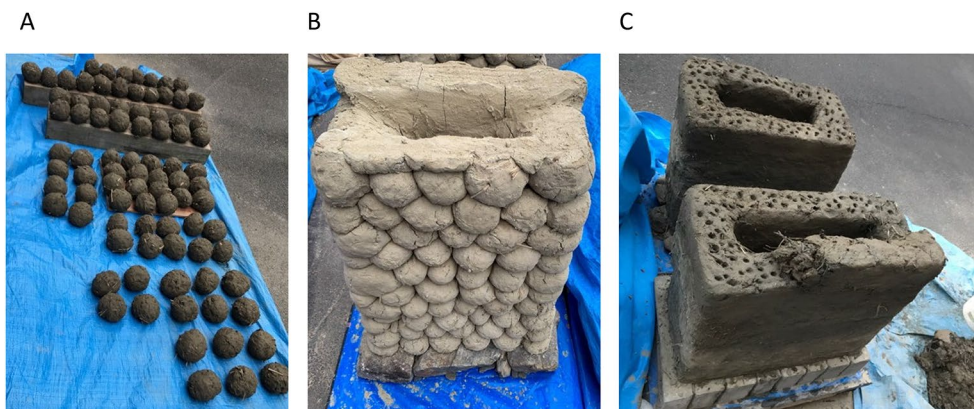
Building the test walls. A: Cob balls drying before implementation. B: Cob-ball wall completed. C: Monolithic cob wall in process of implementation, material mix on right
